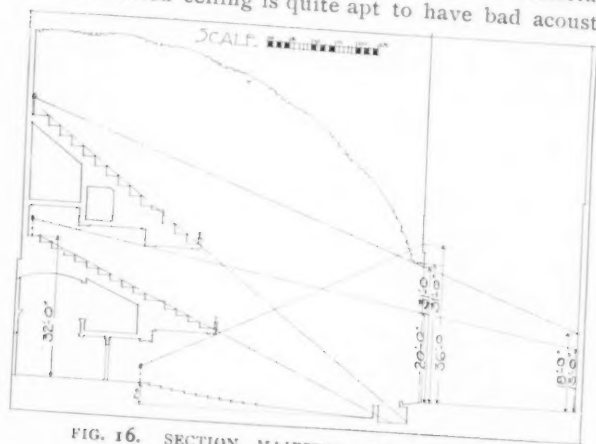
SECTION, MAJESTIC THEATER, BOSTON.
